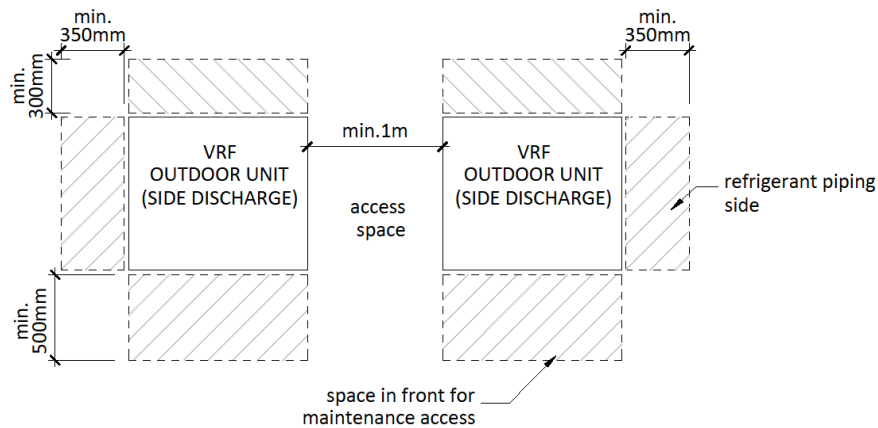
Space requirement for collective VRF outdoor unit (side discharge) - top view
